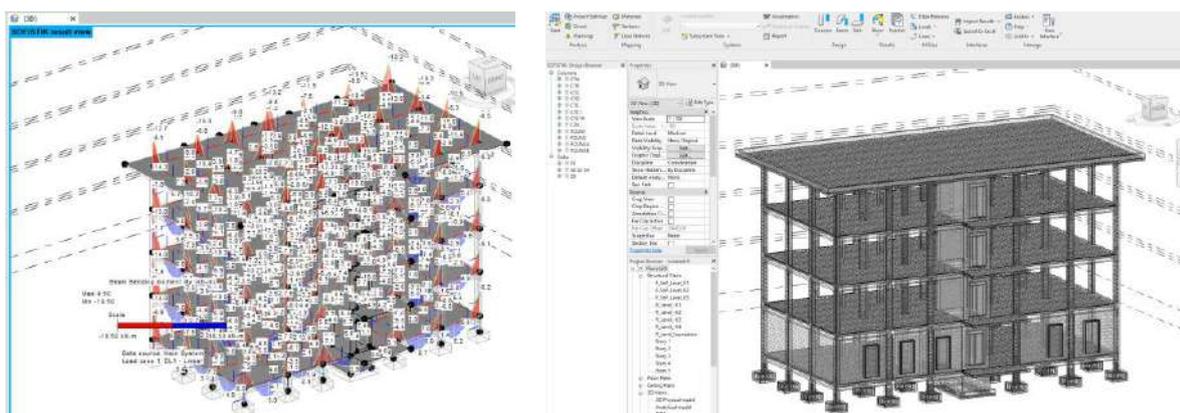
Walls foundation’s strips reinforcements in Robot SA (left) and manual reinforcement detailing required in Revit (right).
